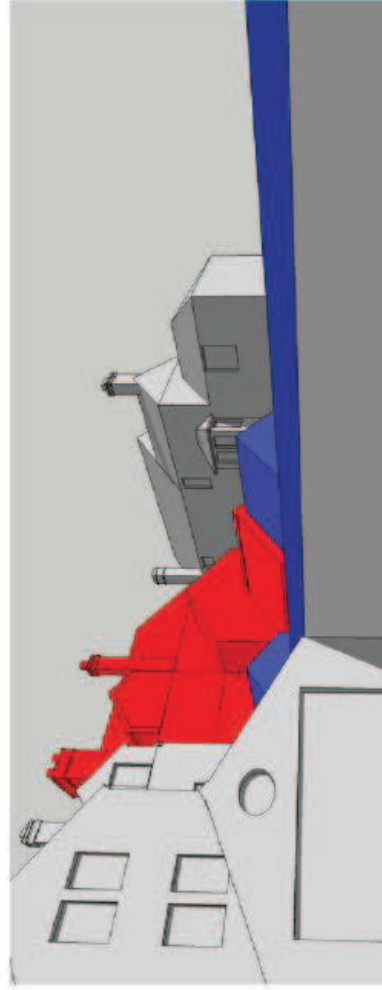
VISUAL SHOWING EXISTING BUILDINGS AT NO. 40 CHALFONT ROAD, HIGHLIGHTED IN RED.
